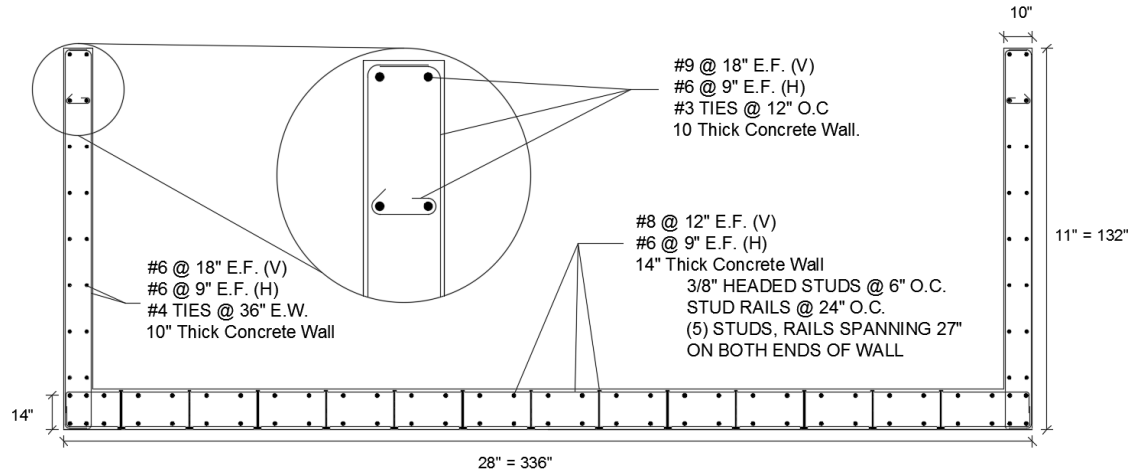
New overall 4th floor Elevator/ Mech. Room shear wall
